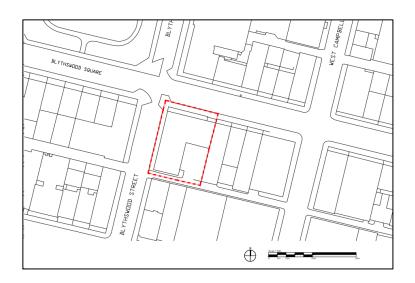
Extract from Site Location Plan (drawing ref: 22004-MOS-ZZ-XX-DR-A-01-000)
